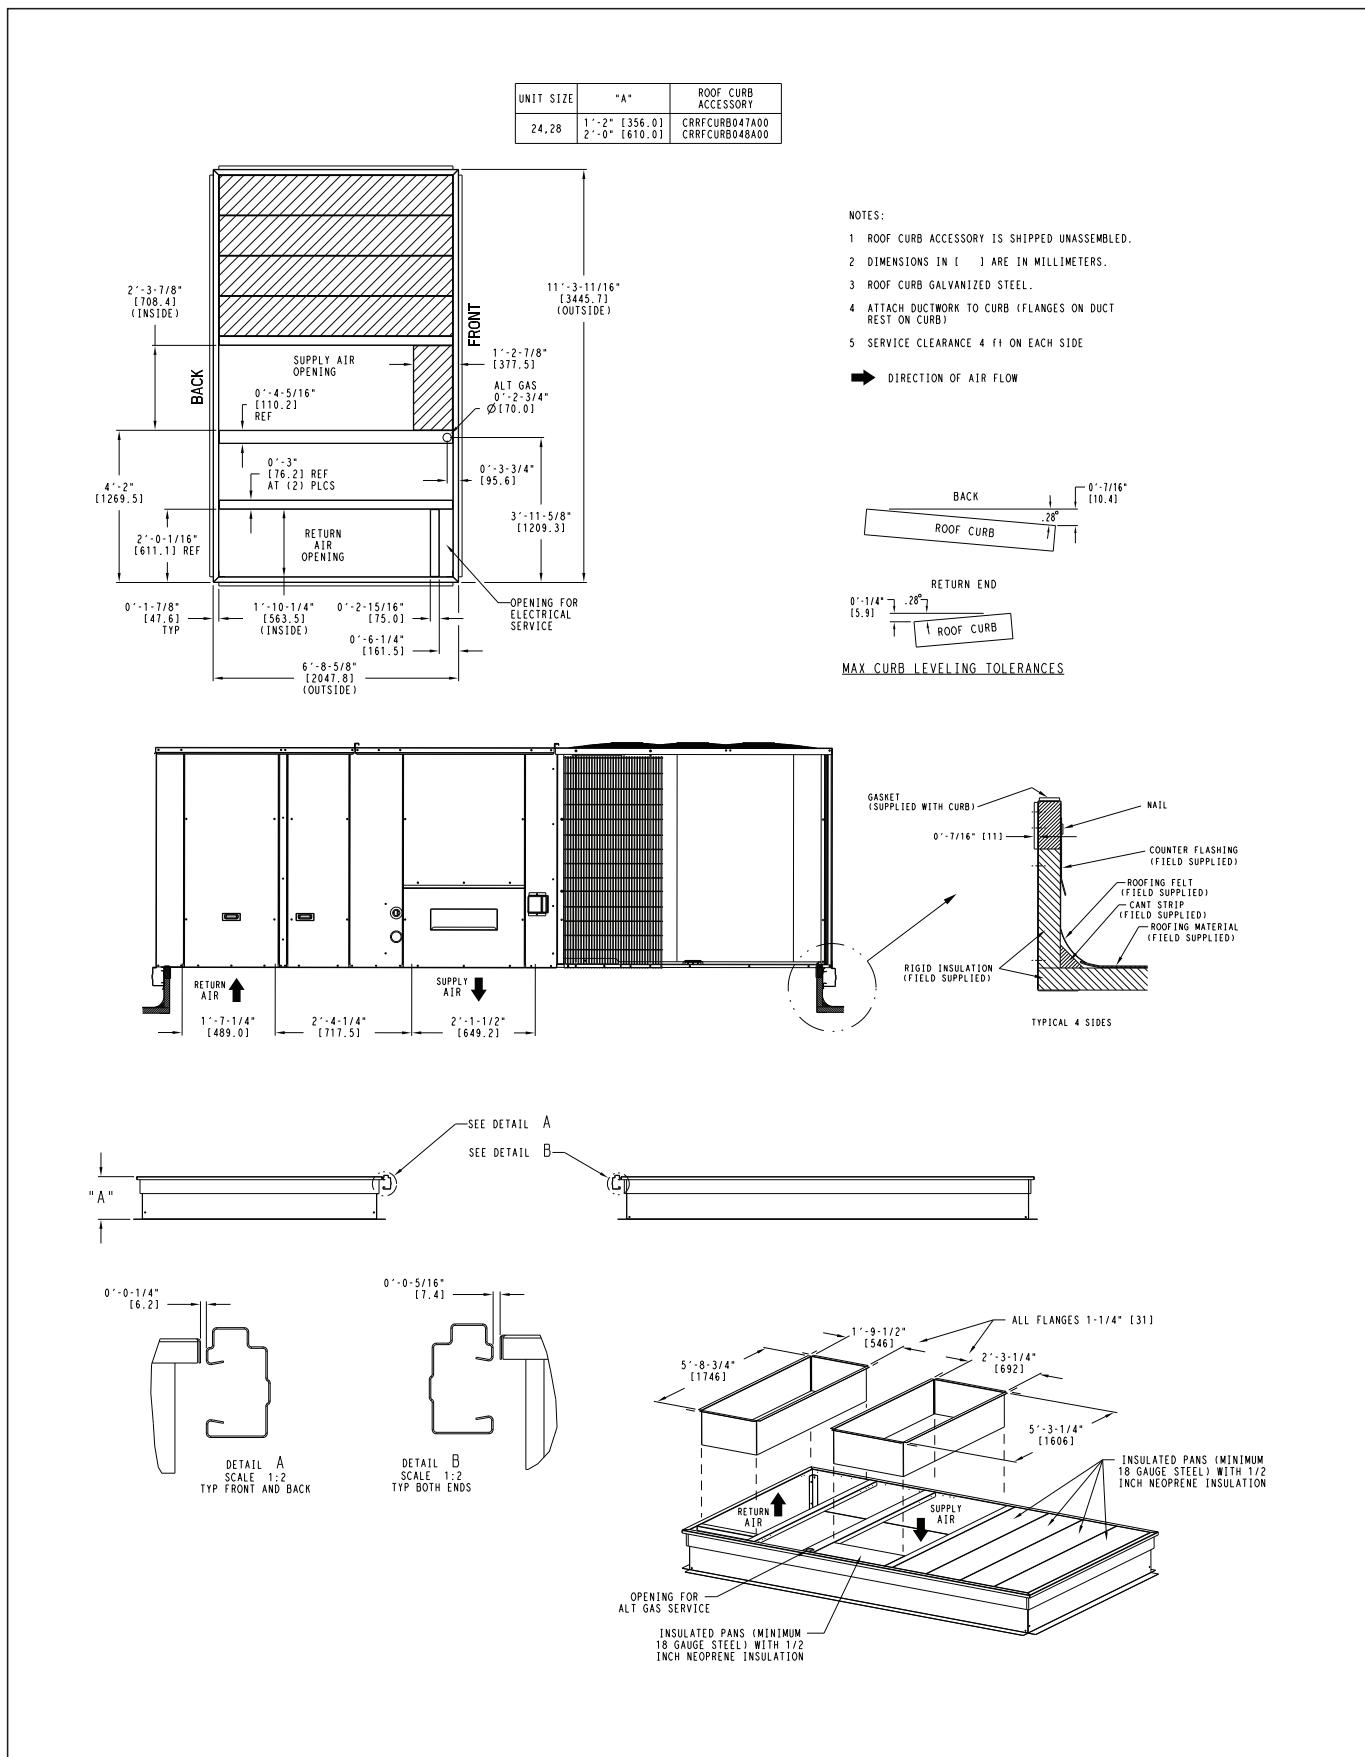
50TC\*\*24 and 28 Roof Curb Details
